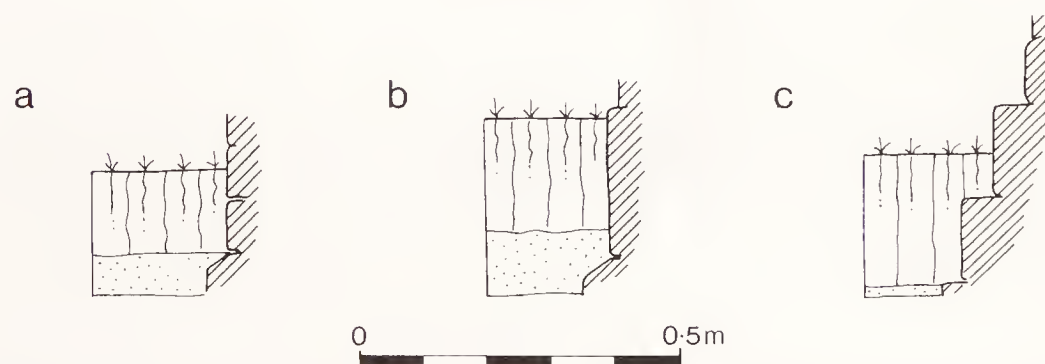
Detail of chamfered plinth around the chancel: a, west end of chancel south wall; b, nave former east wall; c, centre section of chancel south wall.
